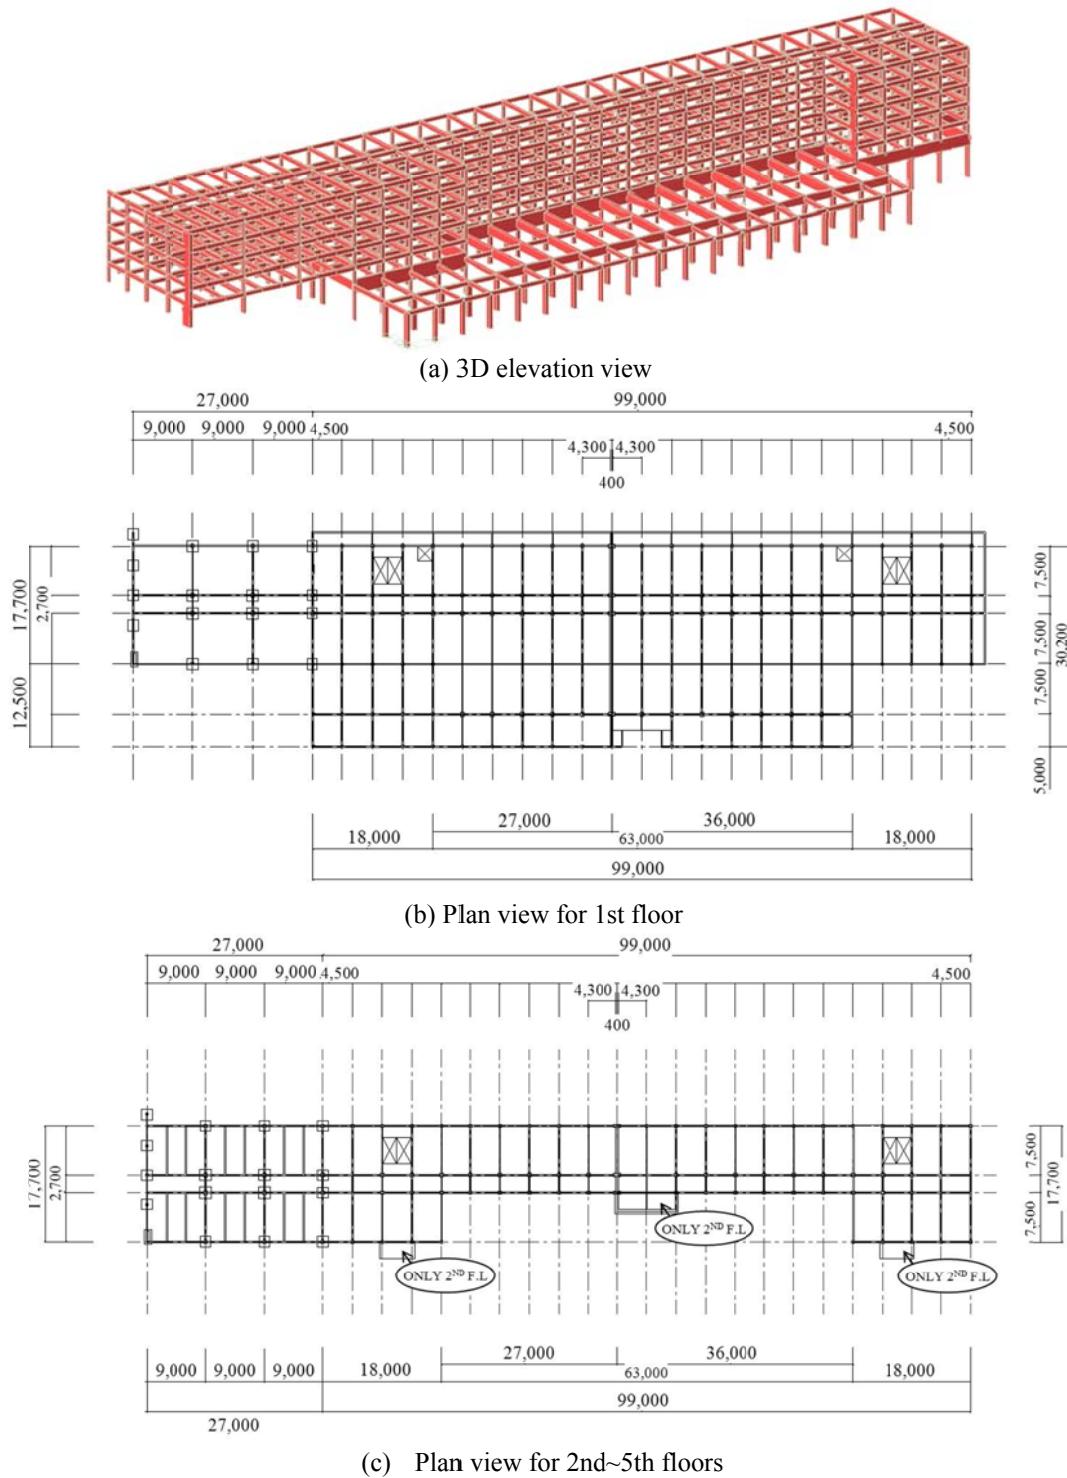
An example building (a high-school building) (KISTEC 2005)
